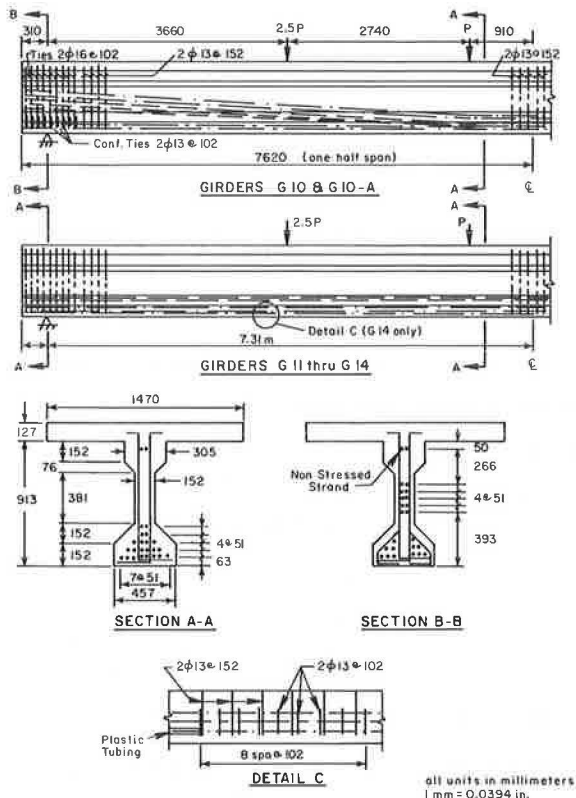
Location of blanketing tubing and crack formers relative to position of loading points.
